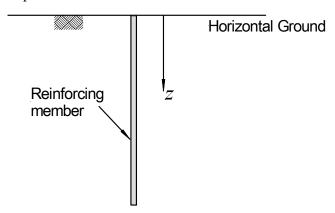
Reinforcing member and ground geometry assumed in Ito and Matsui method (vertical member in horizontal ground).
